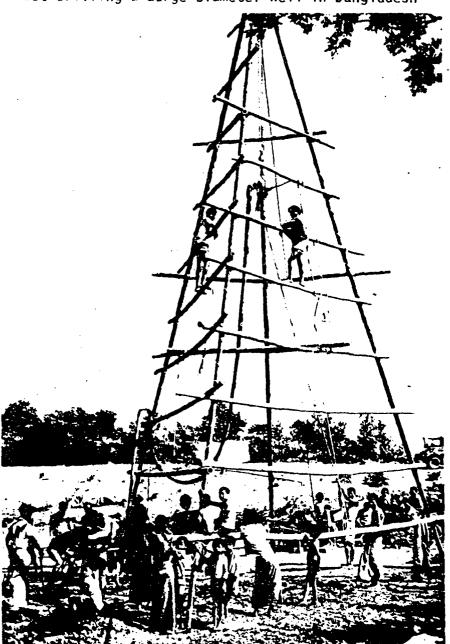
Jet Drilling a Large Diameter Well in Bangladesh
